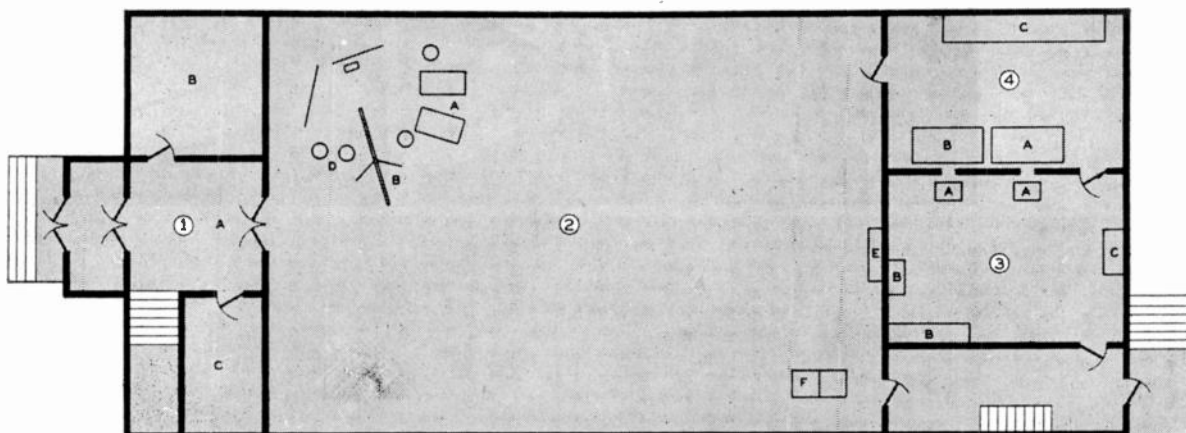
PLAN OF THE GROUND FLOOR, OCCUPIED BY THE OFFICES, STUDIO, PROJECTION ROOM, AND SHOP
